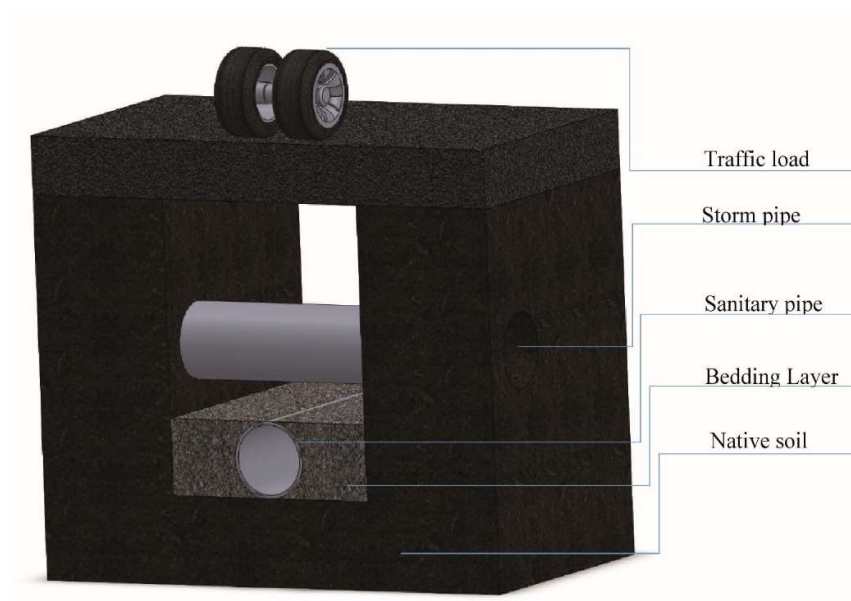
Typical intersection between a sanitary pipe and a storm pipe in a traditional separate sewer system.
